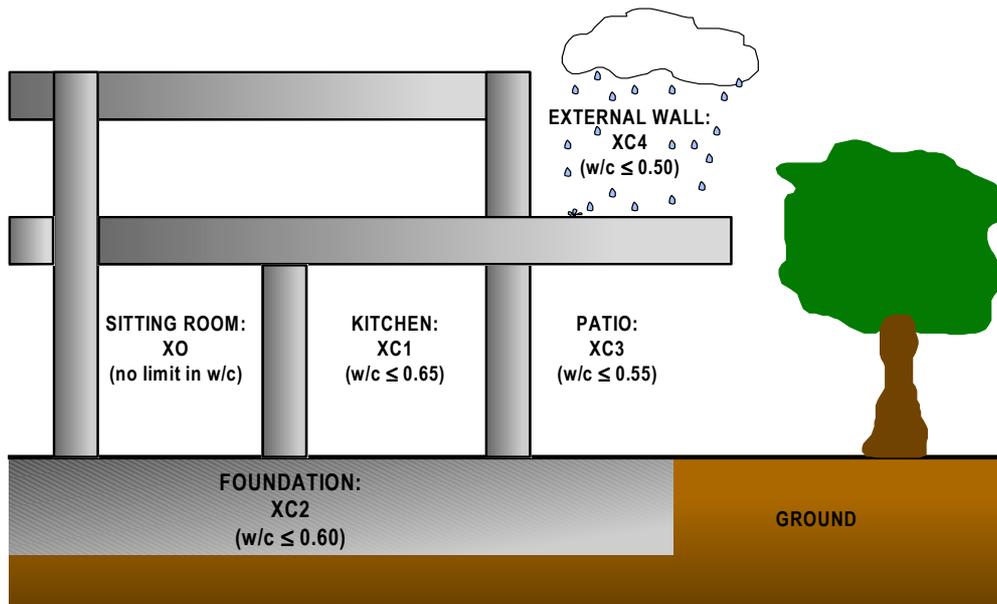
Example of different concrete mixtures which should be adopted in small house according to EN 206.
